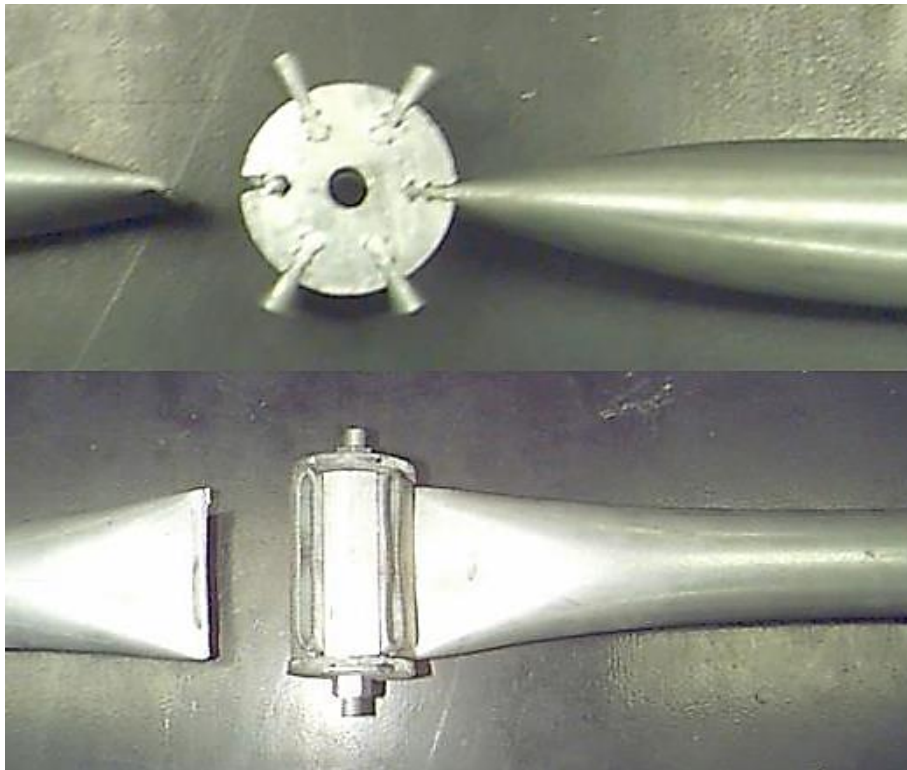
Typical Tensile Test on Specimen with Shim Fillers (Ferregut and Carrasco 1998)
